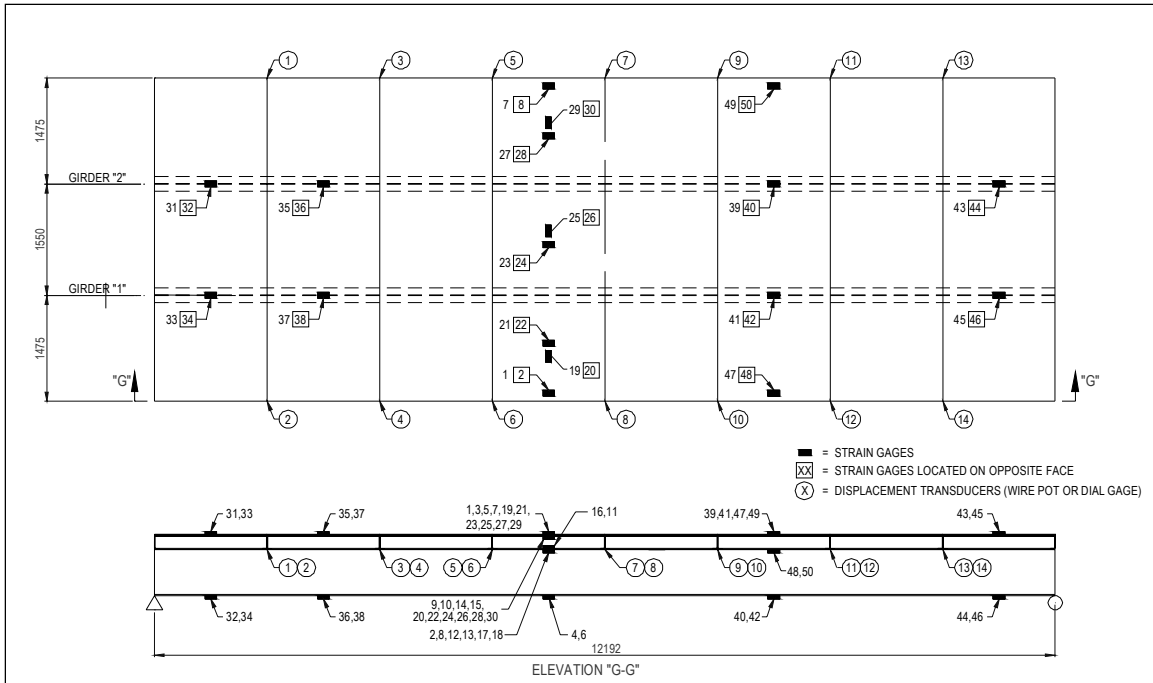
INSTRUMENTATION LAYOUT FOR LOAD CASE C1
